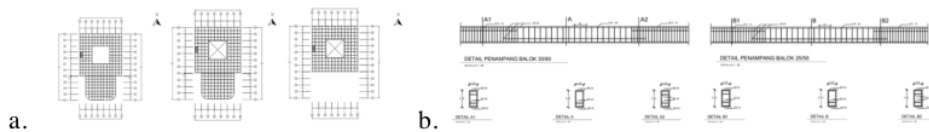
a. Bloking First Until Third Floor Plan; b. Bloking Detail (Pribadi, 2024)
